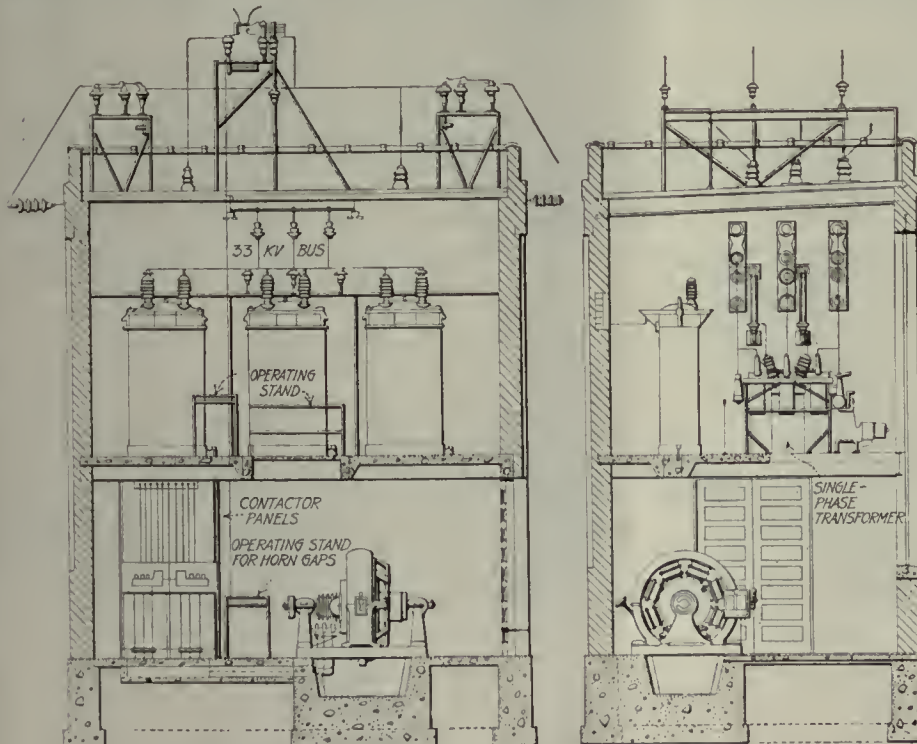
DETAILS OF AUTOMATIC RAILWAY SUBSTATION
